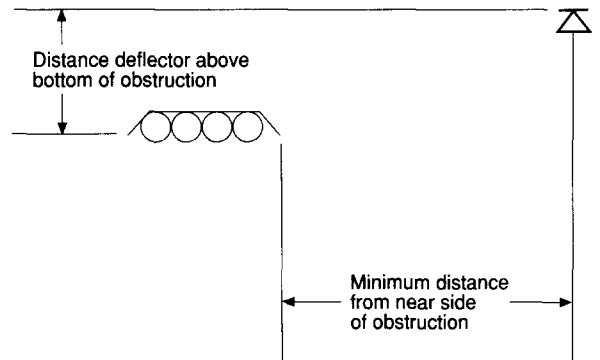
Position of sprinklers in relation to obstructions located entirely below the sprinklers. (To be used with Table 4-4.3.4.2.1.)
